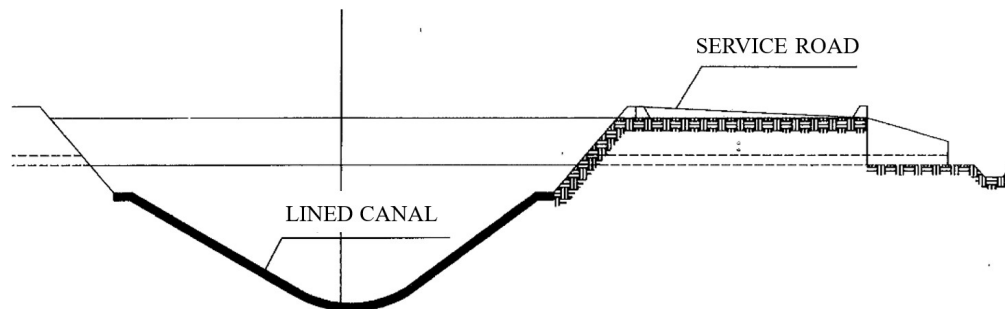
Typical canal cross section and bridges crossing (Terzariol, 2012).
